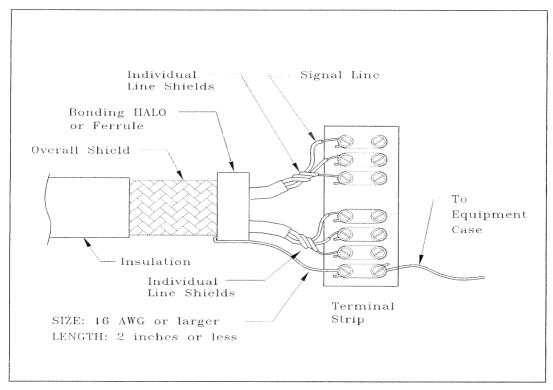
Figure IV. Grounding of Overall Cable Shield to Terminal Strip
